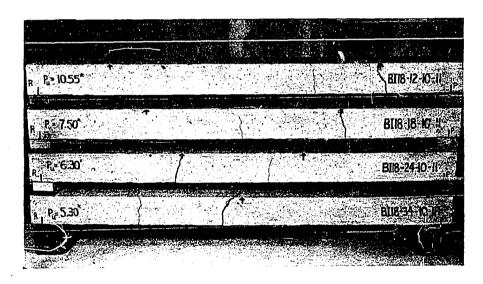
Typical shear-bond failures of beams constructed with deck I-18 gage. Each beam was 12 inches wide and 6 feet in length
